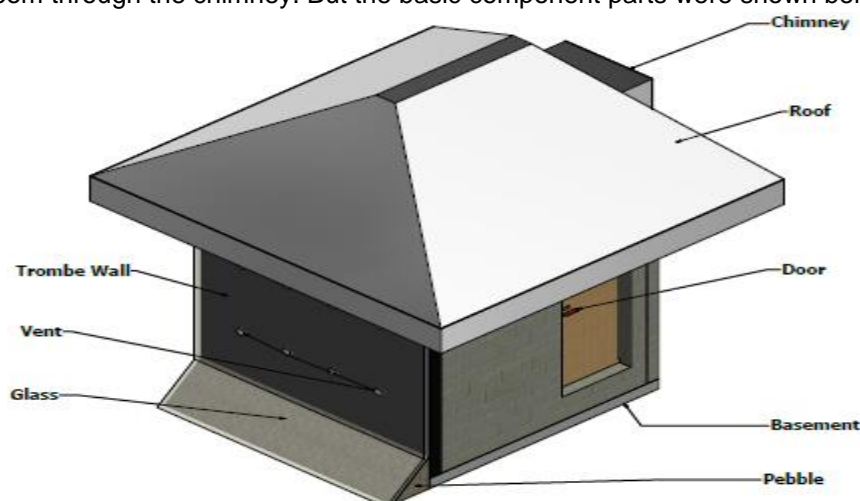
Three Dimensional View of Trombe Wall Solar Chick Brooder with the Component Parts
